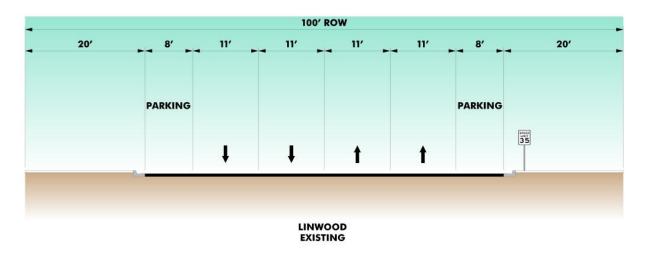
Enhanced Streetcar Linwood Blvd Typical Section, Existing Conditions
